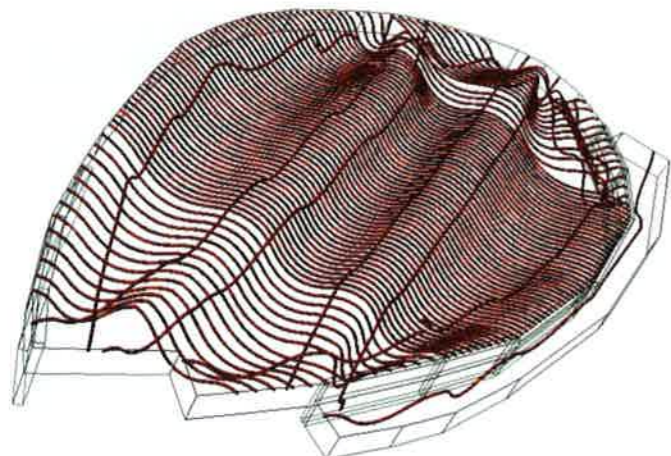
View of a Typical Post-Tensioned Flat Slab Construction in California (P314)
